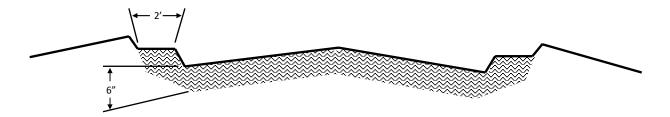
Typical Cross-Section of Roadway Subgrade Requiring Scarification
